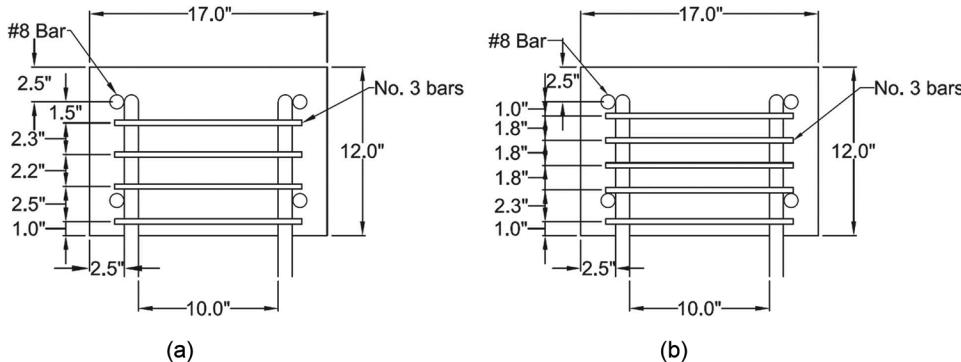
Plan view of hooked bars with confining reinforcement oriented perpendicular to bar being developed satisfying maximum spacing requirement in ACI 318-14, Section 25.4.3.2: (a) four No. 3 (No. 10) hoops; and (b) five No. 3 (No. 10) hoops. (Note: 1 in. = 25.4 mm.)
